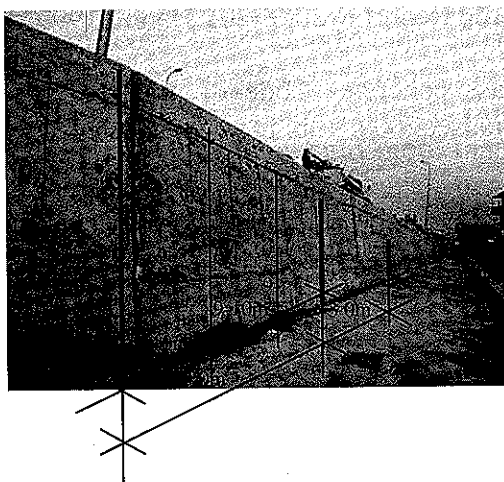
Placing expansion and contraction joints to a concrete road wall in Hanoi
